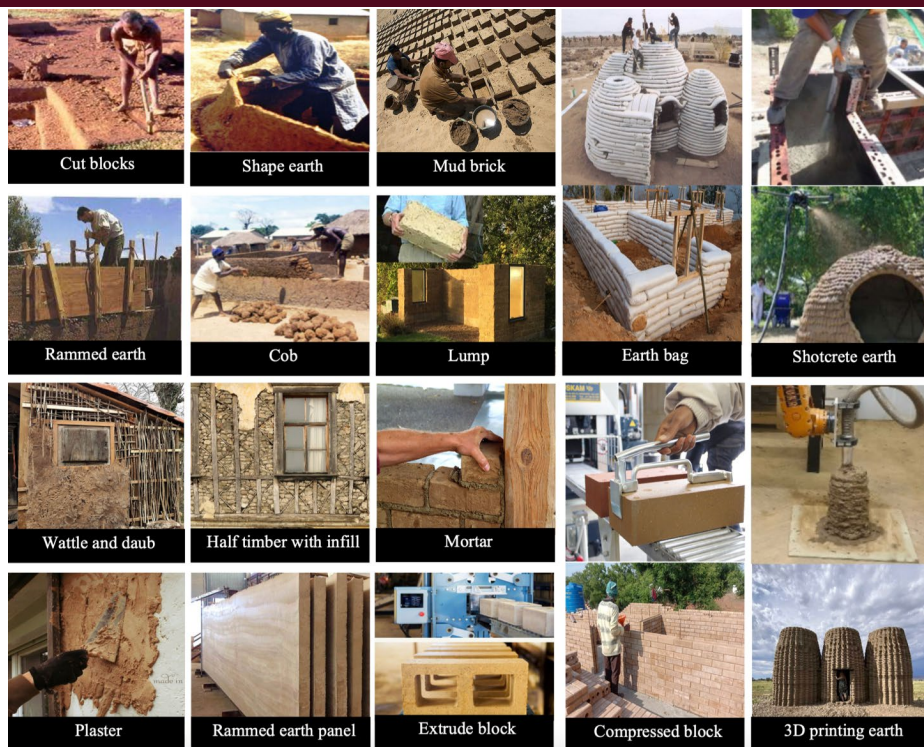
Examples of techniques of earth in wall construction (Created by the authors)
